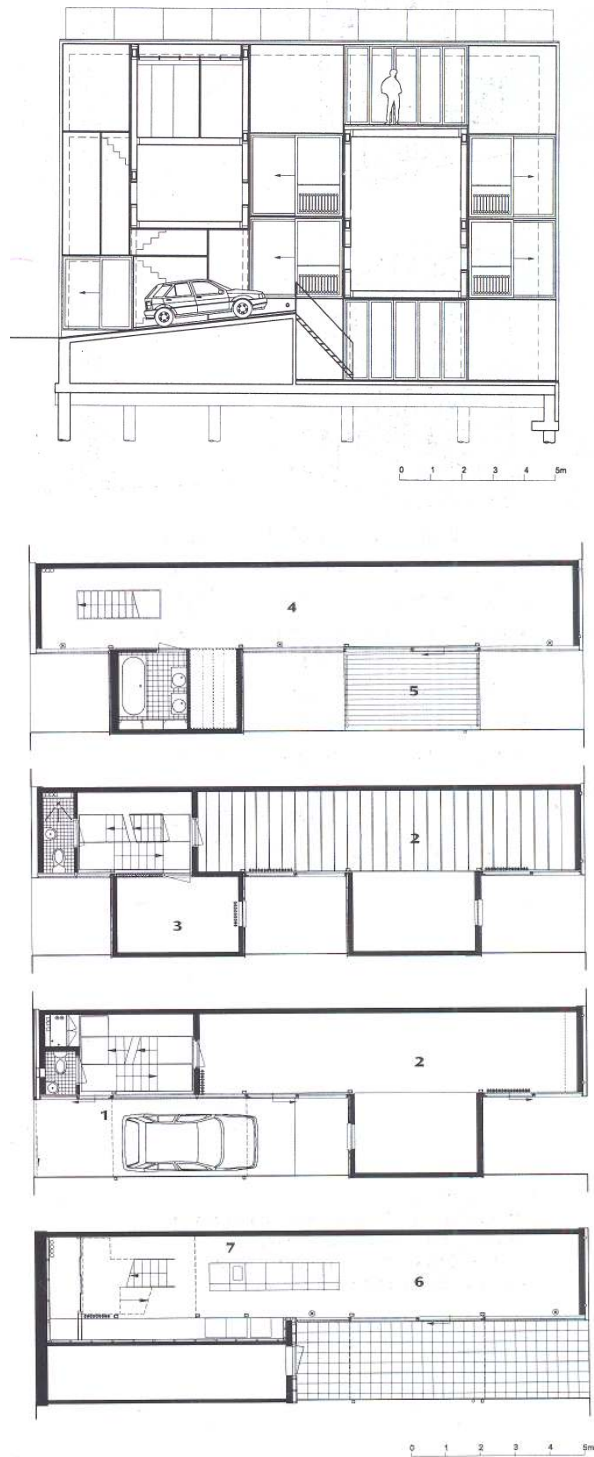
Section and plans of the house designed by MVRDV (1 Entry, 2 Work space, 3 Bedroom, 4 Living area/bedroom, 5 Terrace, 6 Dining area, 7 Kitchen). Source: Terence Riley, *The Un-Private House* (New York: Museum of Modern Art, 1999), 61.
